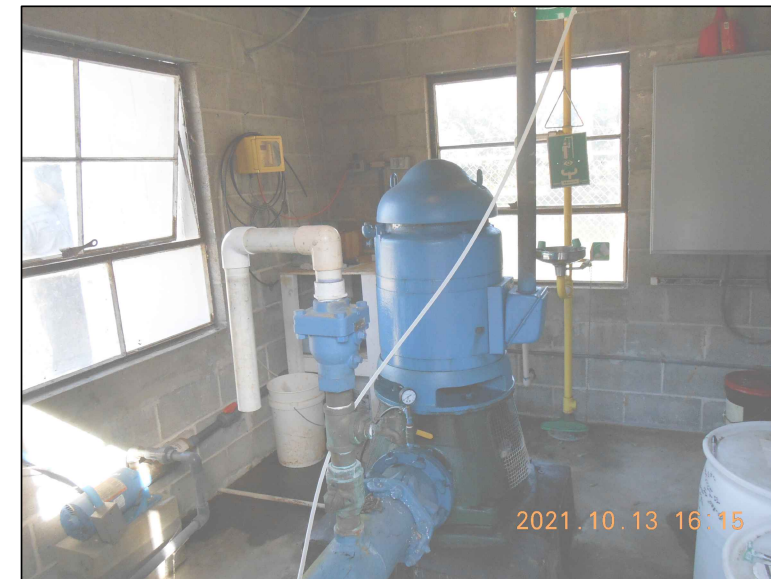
LOOKING EAST TOWARD WELL PUMP
